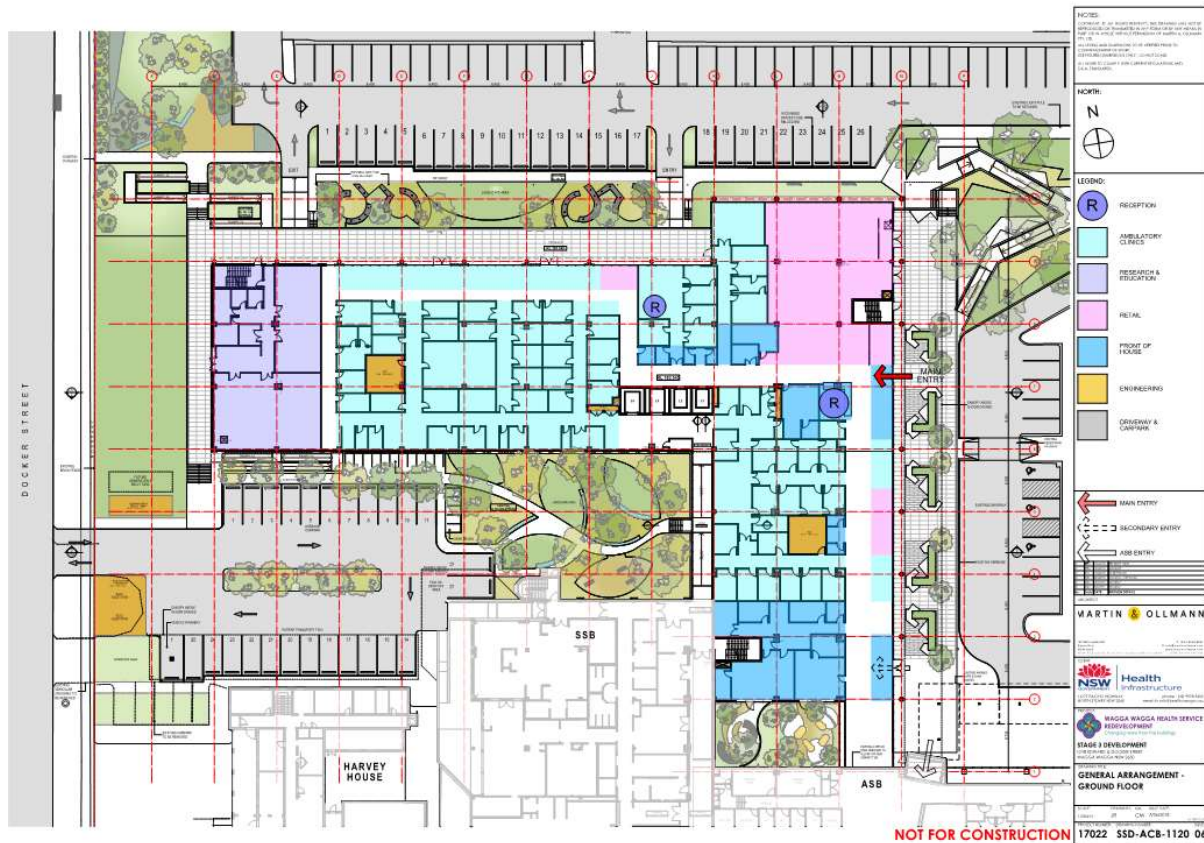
The Architectural Site Plan (by Martin & Ollmann)
